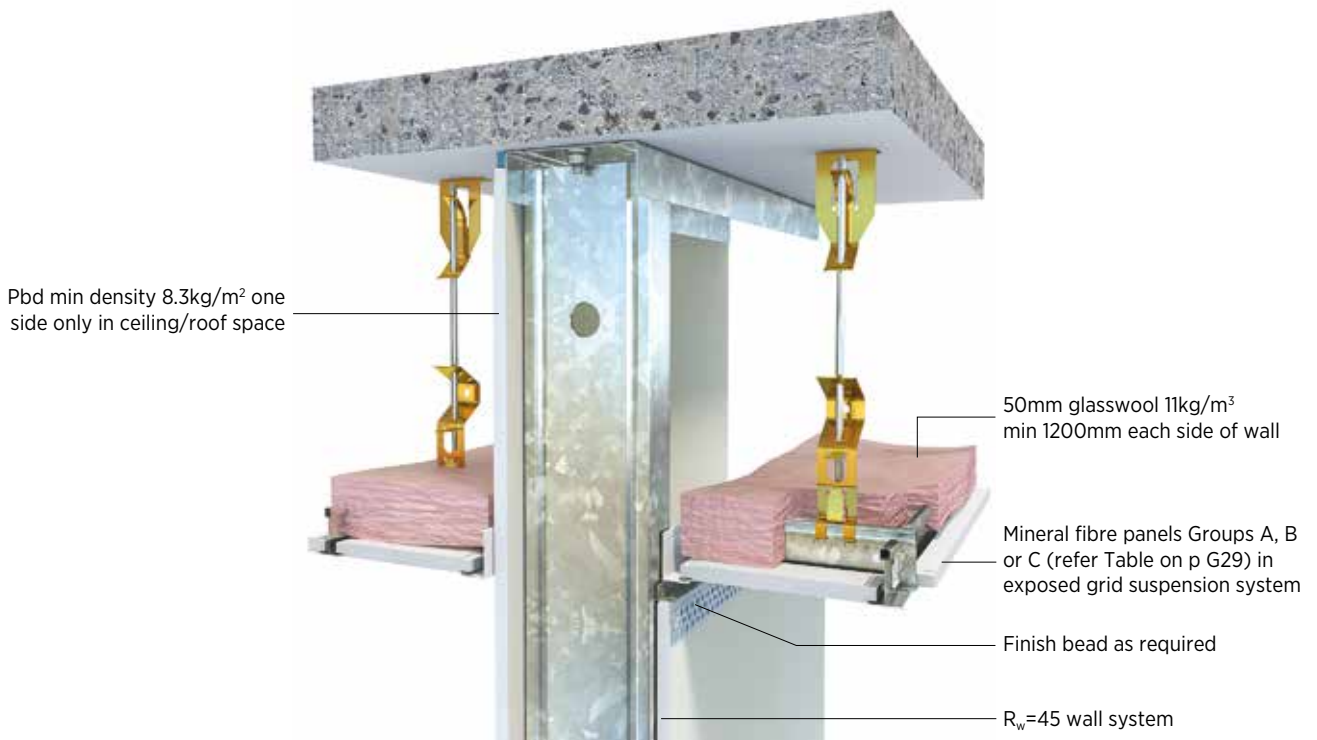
Ceiling configuration to maintain an $R_w=45$ wall acoustic rating (System OP.8 shown)
